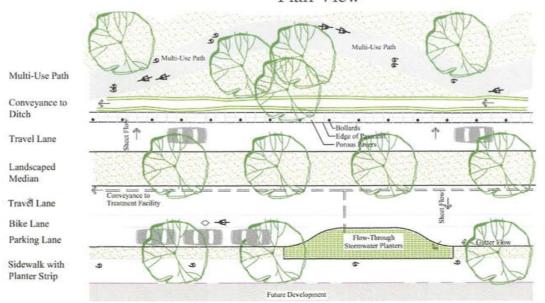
Ridge Parkway and Central Parkway Green Streets
